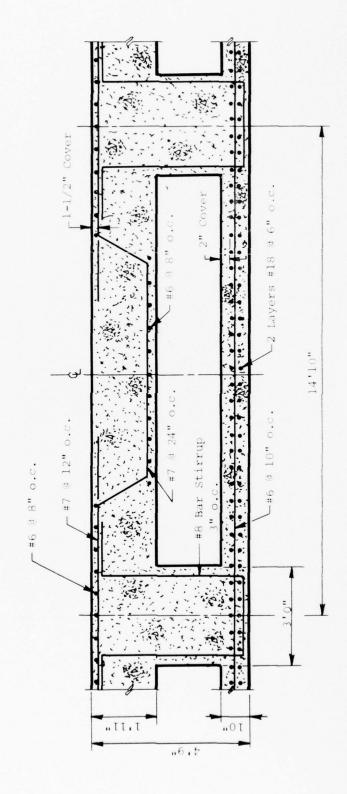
Box Girder for 100-Foot Span 2000 psf Surcharge
